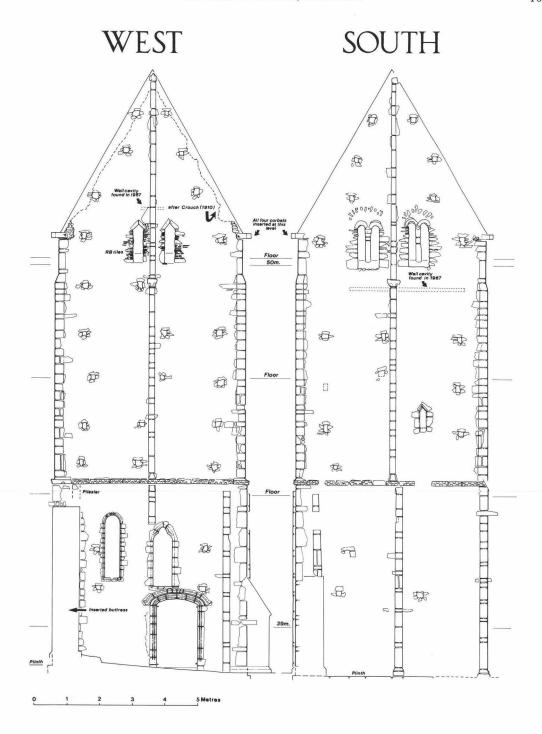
External elevations of the tower (Based on site drawings at 1/20 by F. G. Aldsworth July 1984).
